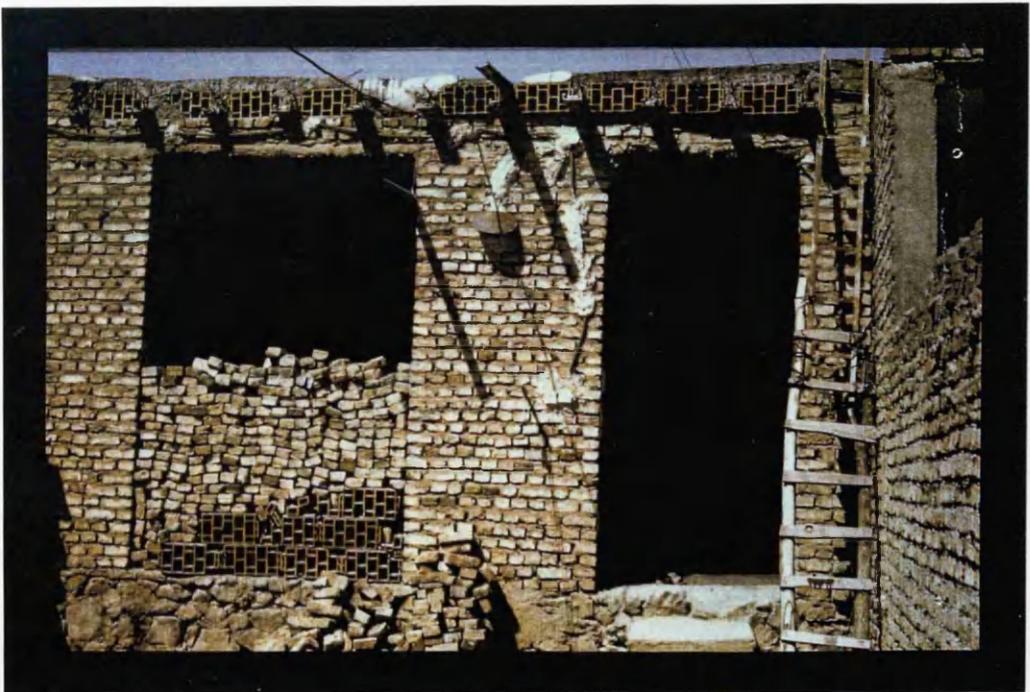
Incomplete building, using in situ concrete beams, fire bricks and kiln dried bricks in Karevan.
